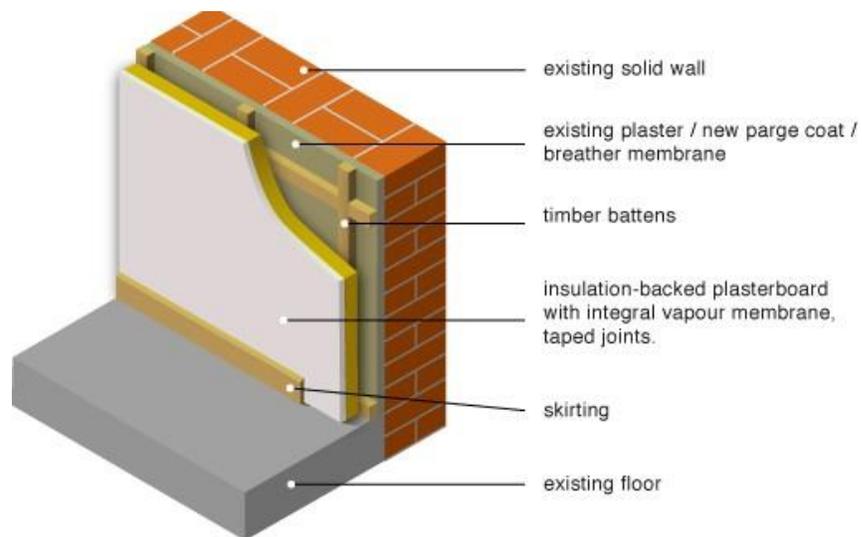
Internal wall insulation: battens with insulation (Source: www.greenspec.co.uk building design).
